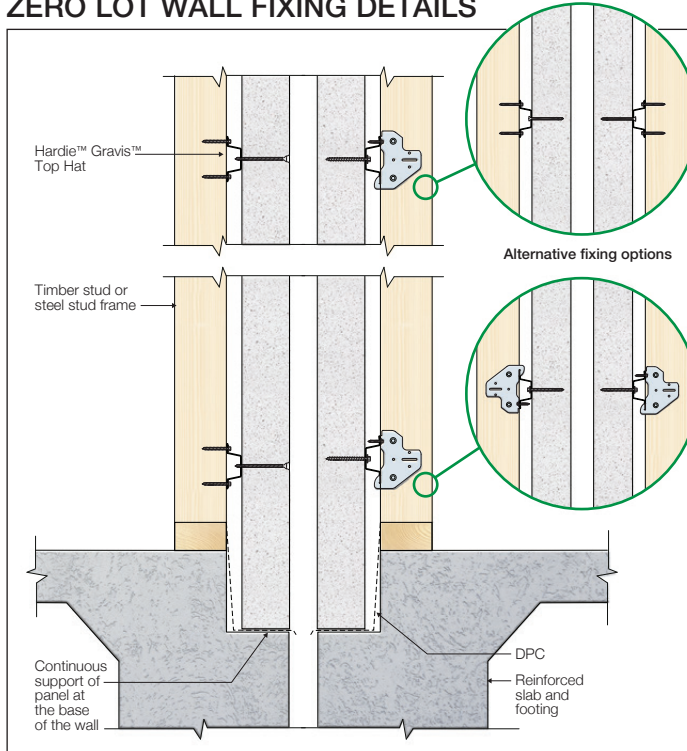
ZERO LOT WALL FIXING DETAIL
